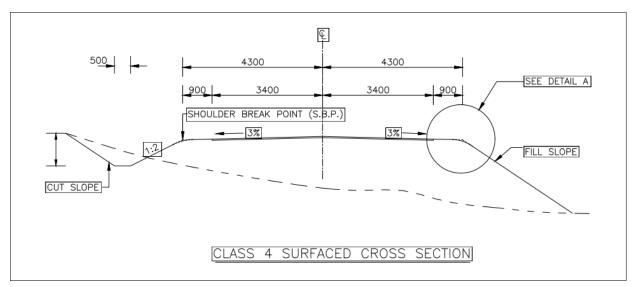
Typical cross-section for Class 4 low-volume sealed road
